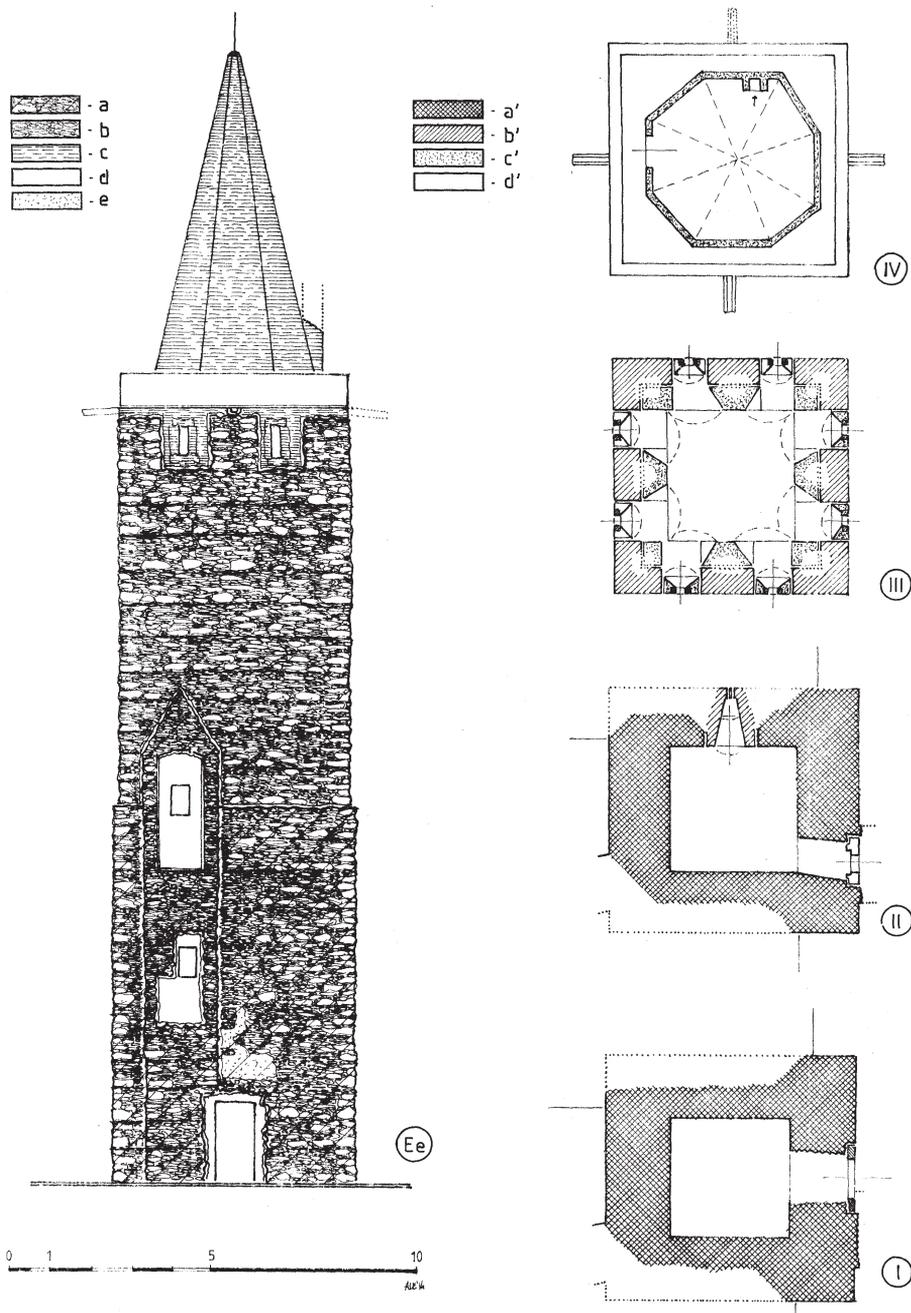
Bystrzyca Kłodzka, Kłodzka Gate's tower, eastern elevation (Ee) and projection of dungeon levels, defensive, entrance and bypass of the helmet (I–IV) with chronological wall stratification (signs: a, a' – Gothic walls from the 14<sup>th</sup> century; b, b' – Gothic walls from the 15<sup>th</sup> century; c, c' – Renaissance walls from around 1568; d, d' – walls from the 20<sup>th</sup> century and unrecognized walls; e – elevation plasters (drawn by A. Legendziewicz)
